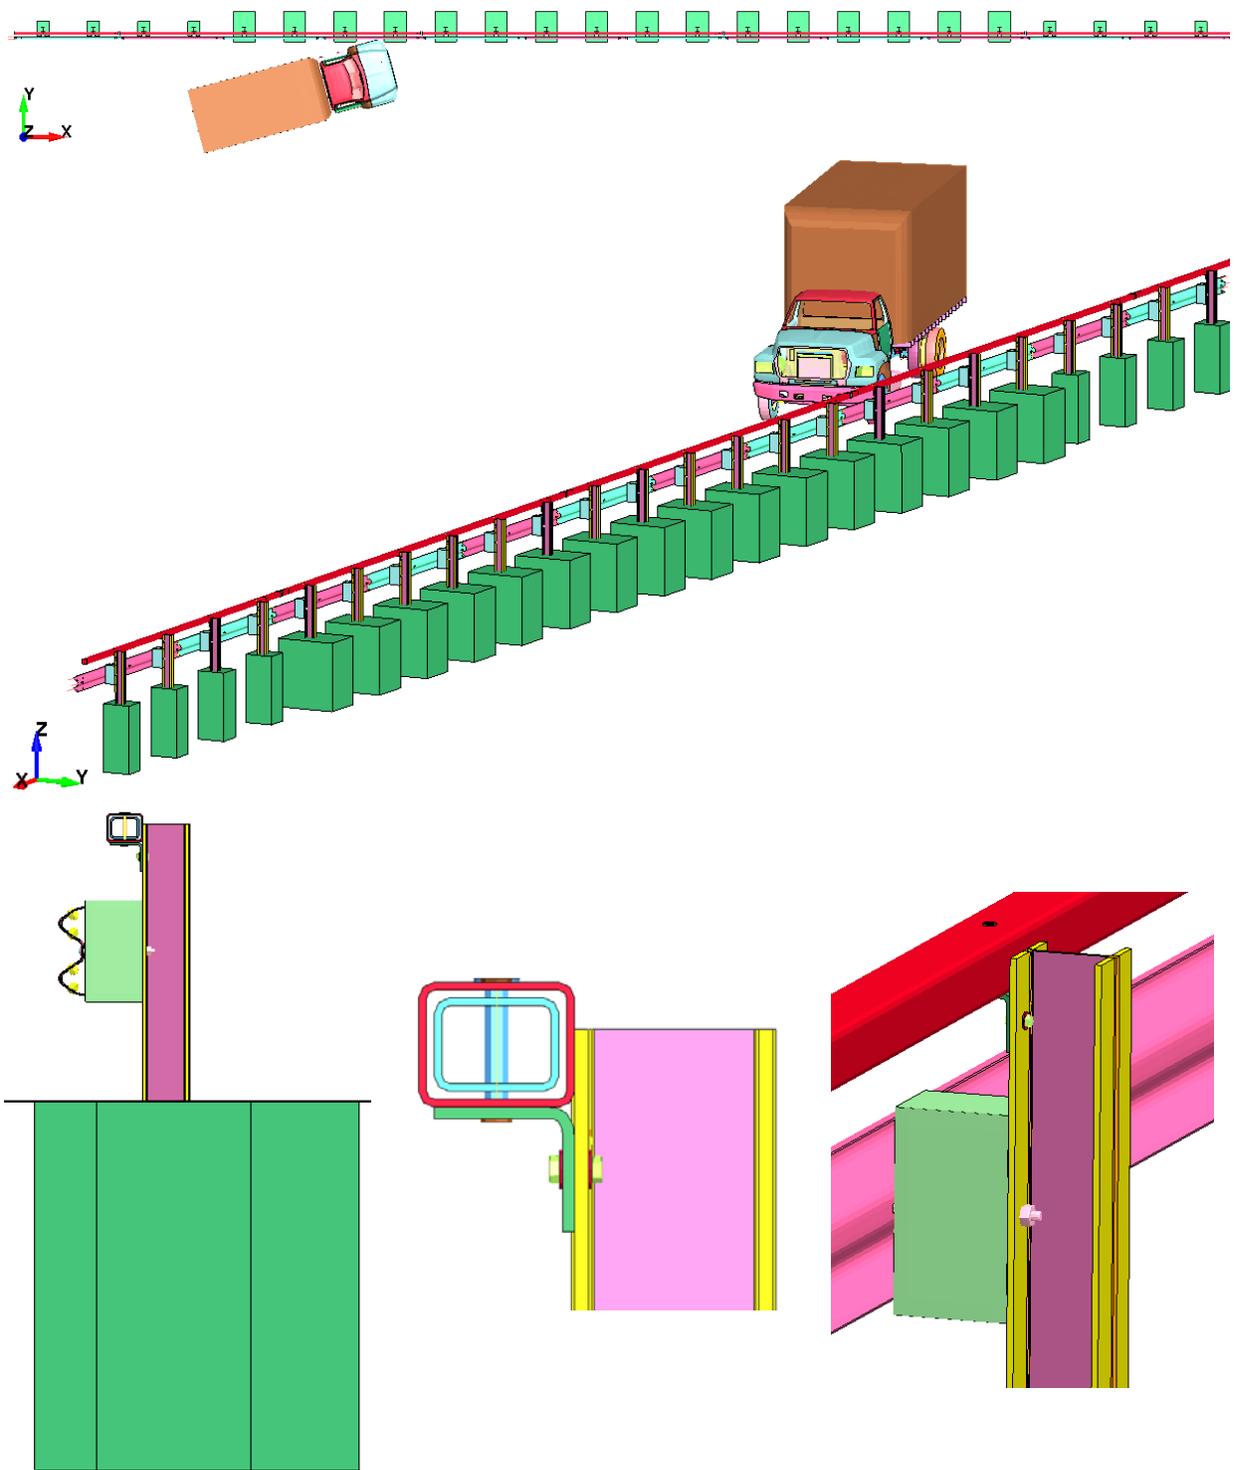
FE Model of the Guardrail System Design Recommended for Full-Scale Testing.
